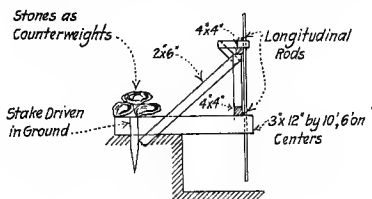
Supporting rod reinforcement of cantilever wall.
